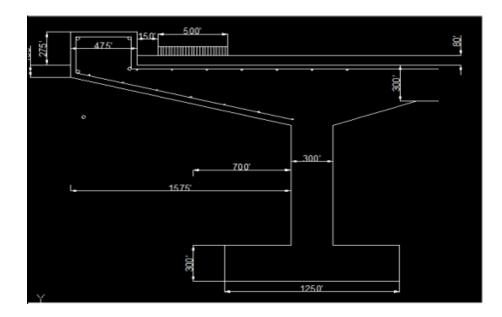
TYPICAL REINFORCEMENT FOR CANTILEVER SLAB
